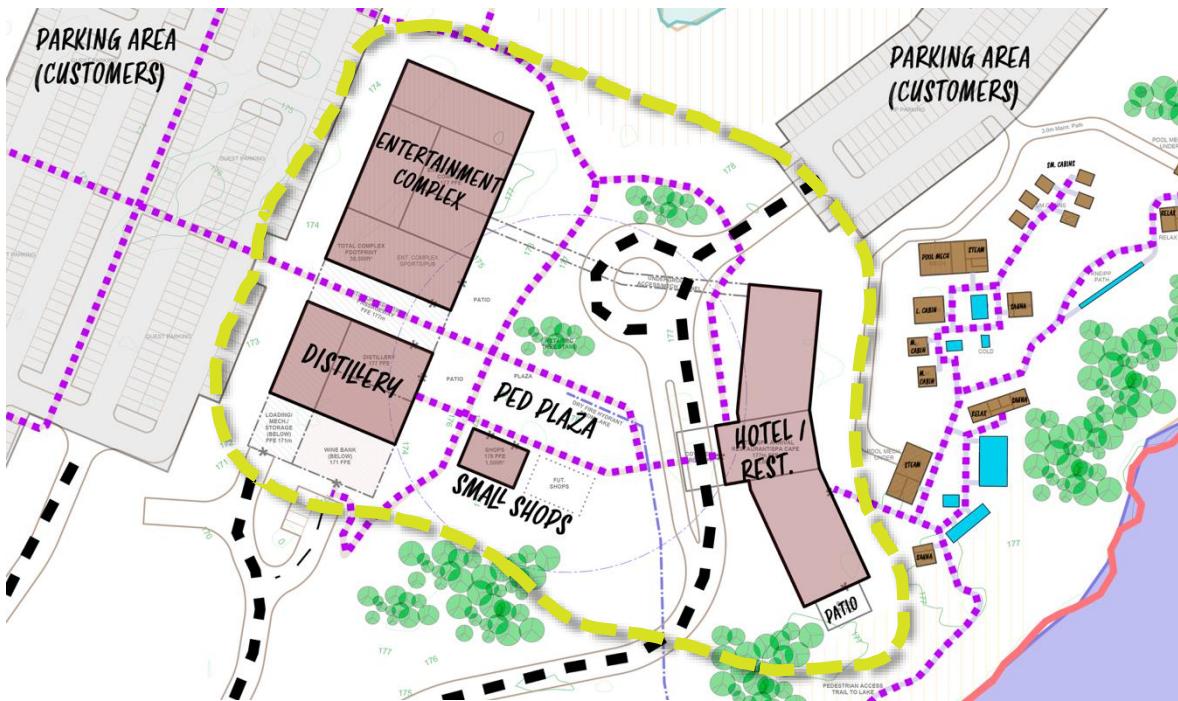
Hotel and Entertainment Court, Concept Plan Extract
